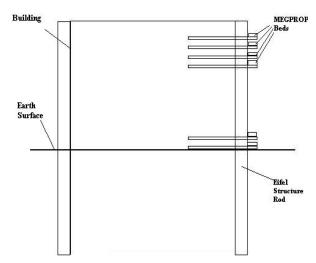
Cut section side view of building with MegEifel rod at side. MegEifel rods further have horizontal beams at each floor. Shells or MegProp beds resting on horizontal beams and moved to outside of building when earthquake has struck are shown.
